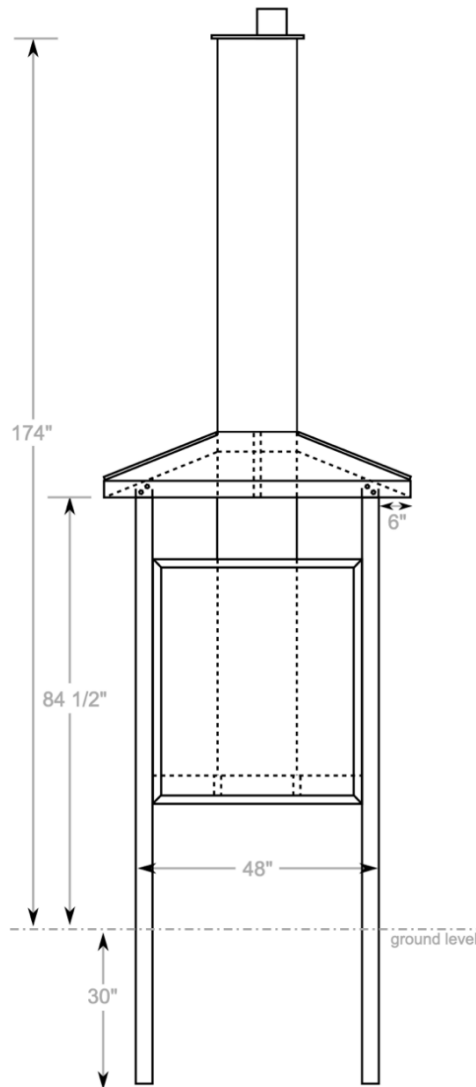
A completed Chimney Swift Tower is approximately 15 feet tall and 5 feet wide. It requires a minimum footing depth of 30 inches (as shown).
